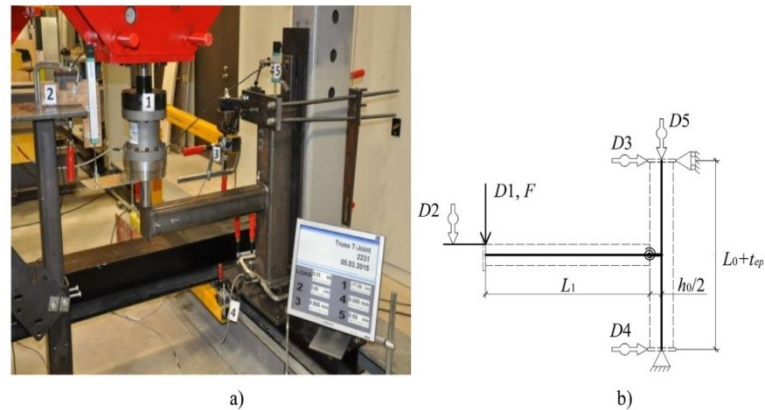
Test setup: (a) test arrangement overview, (b) static model of test specimen.
